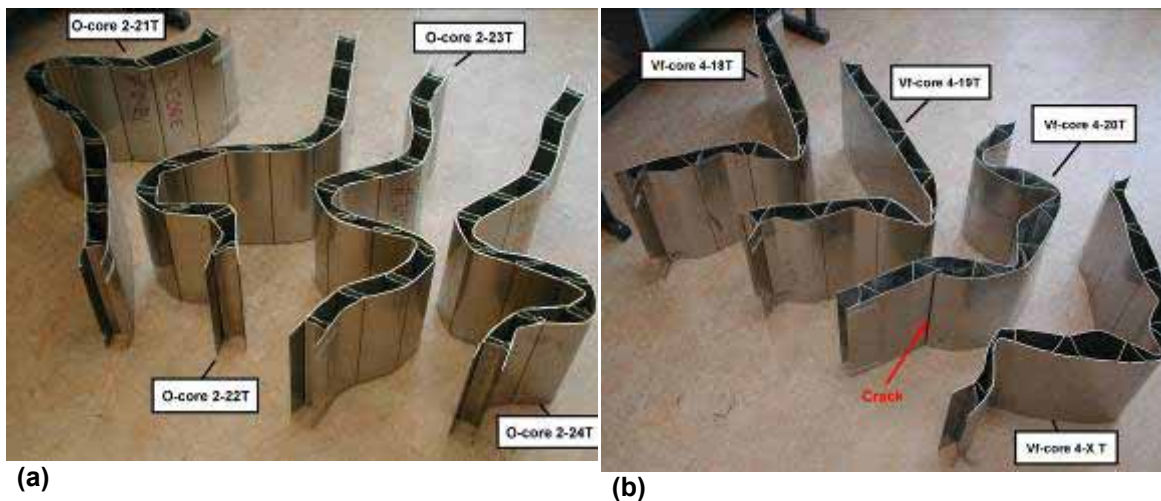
Panel sections after transverse crash tests: (a) O core = rectangular hollow section type and (b) V_f core = sheet profile type (DOLTRAC p.187).
